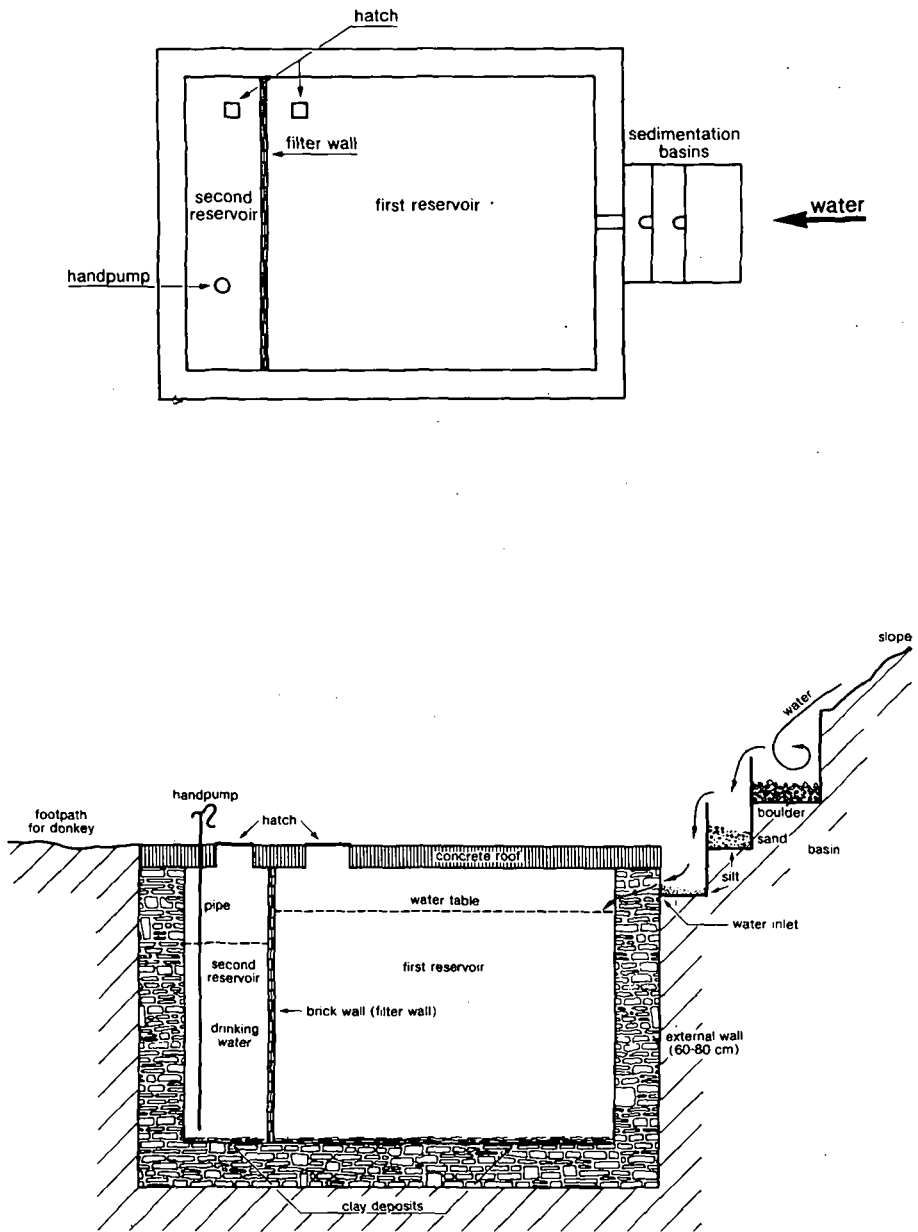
Ground plan and vertical section of a two-chamber cistern, built at Karady
